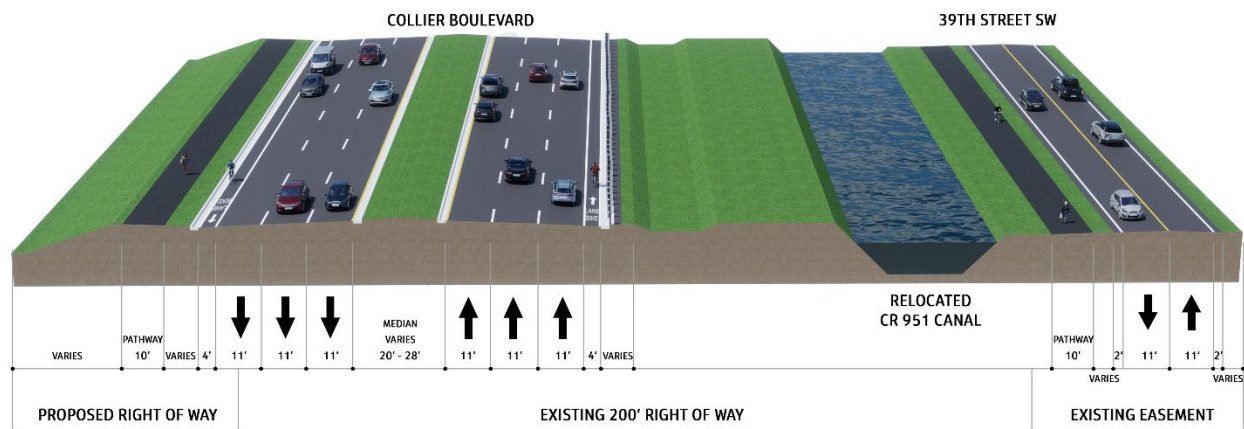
Proposed/Planned Typical Section for the Collier Boulevard Phase III Widening Project
